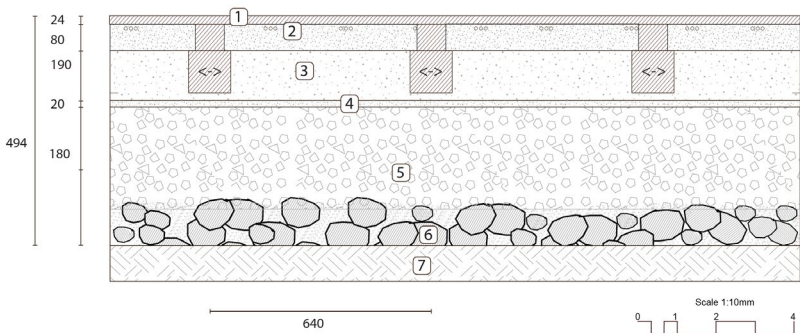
Ground-floor details - Scale 1:100 (Author's drawing)
